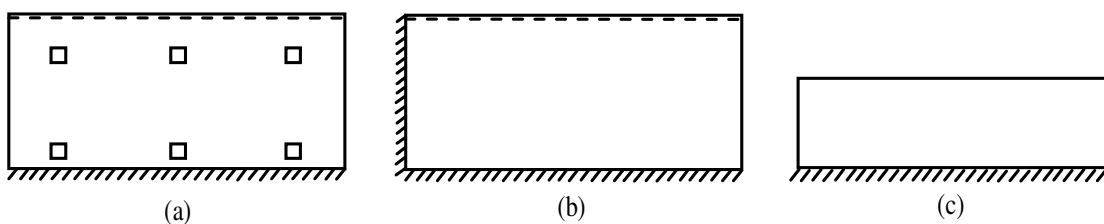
Slabs with various support conditions: (a) flat slabs supported by columns, wall and beam (b) slab supported along three edges (c) cantilever slab.
